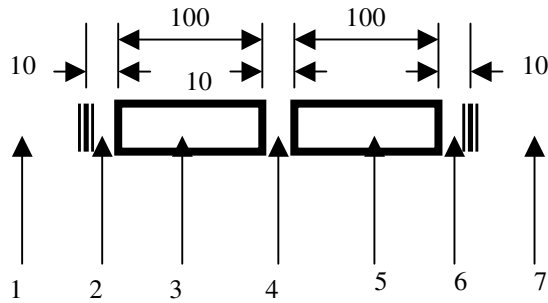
Cross section of a wall construction currently used in Botswana (all dimensions in mm)
